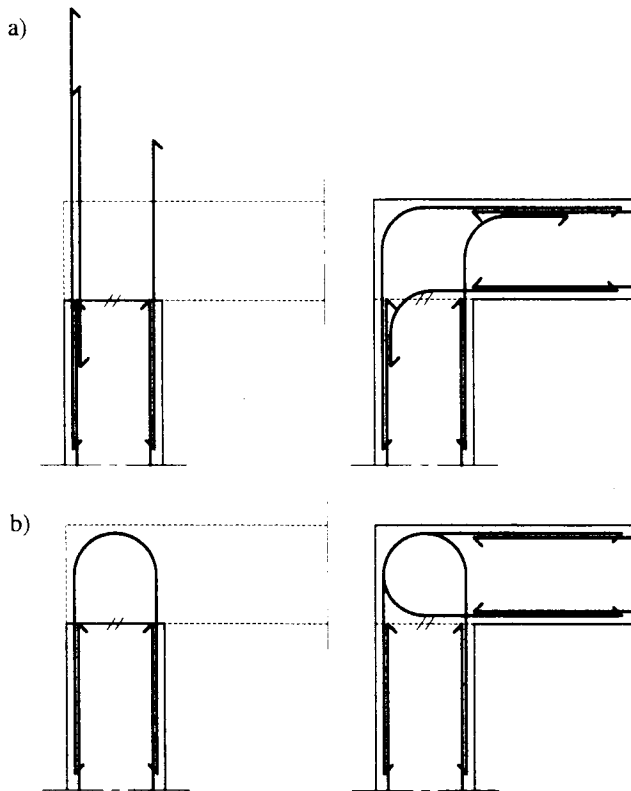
Schematic figure of the construction of a concrete frame corner using different reinforcement detailings: a) splicing in the slab, b) splicing within the corner area.
